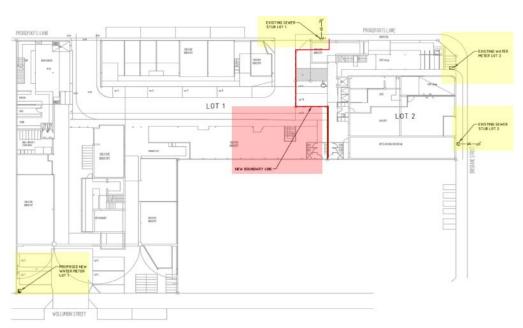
Extract of proposed plan highlighting service provisions and proposed new boundary
